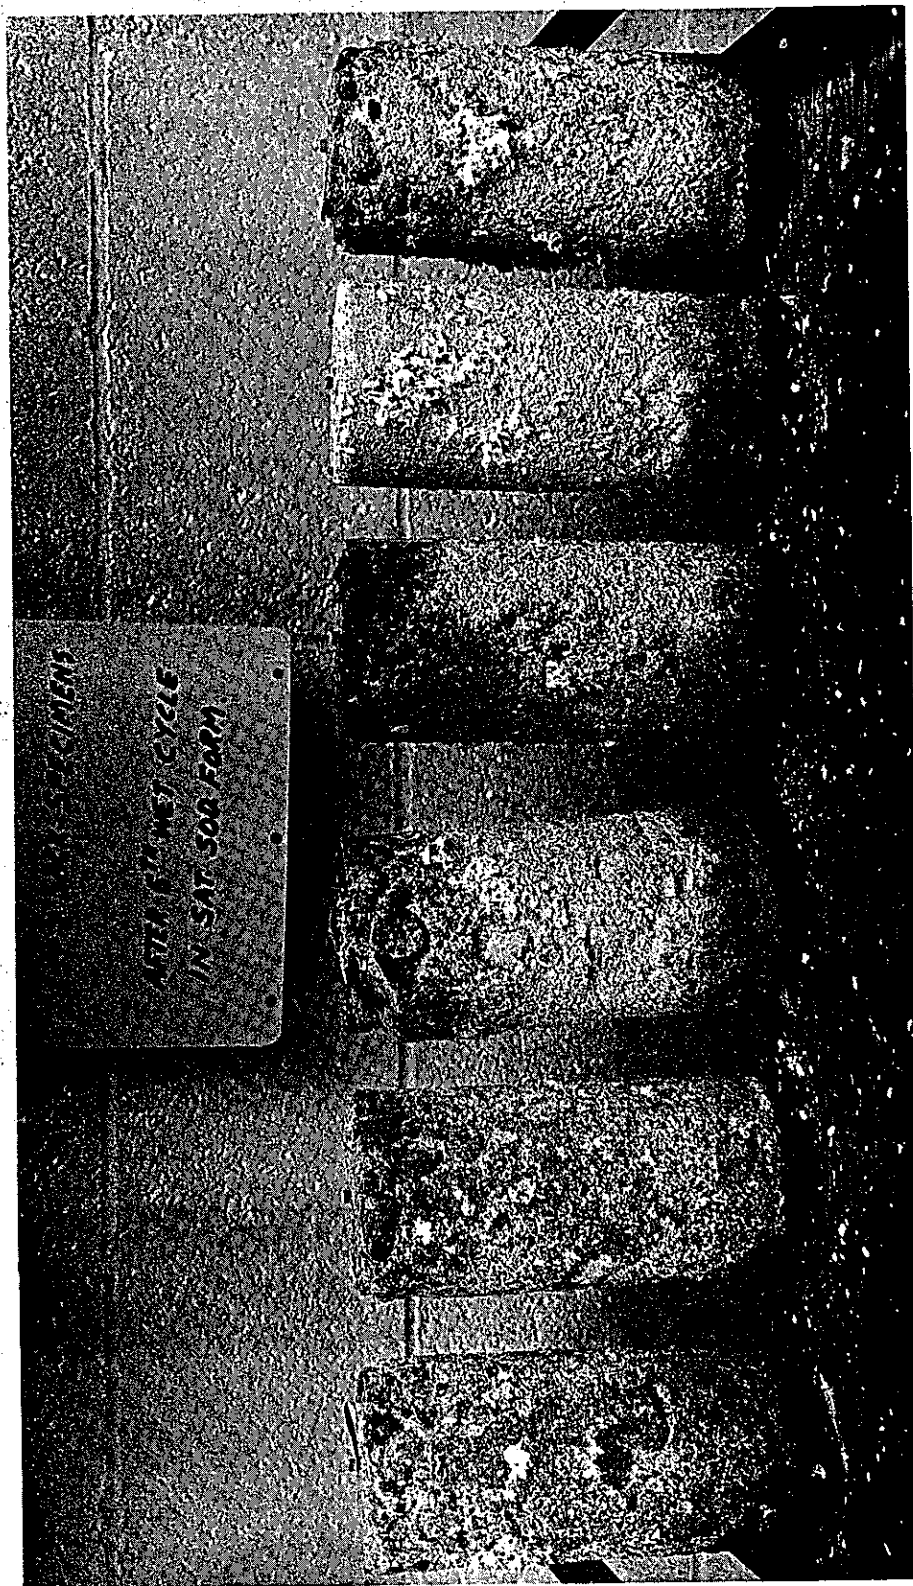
Amount of concrete deterioration after five and six cycles of alternate immersion in sodium formate for 4-1/2-sack concrete
